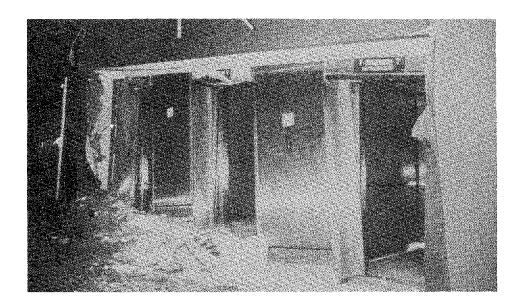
Elevator and service stair lobby, Olive View Hospital, 1971 San Fernando Earthquake. Service stair doorway is visible at the extreme left (see also Fig. 1.1). (Photo reproduced with permission from <u>Engineering Aspects of</u> the 1971 San Fernando Earthquake.)
